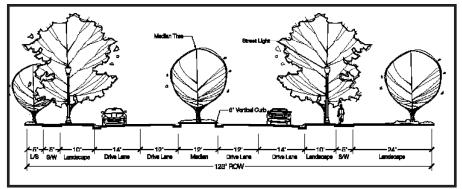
Arterial Road - Union Road South of Community Entry, Section D
